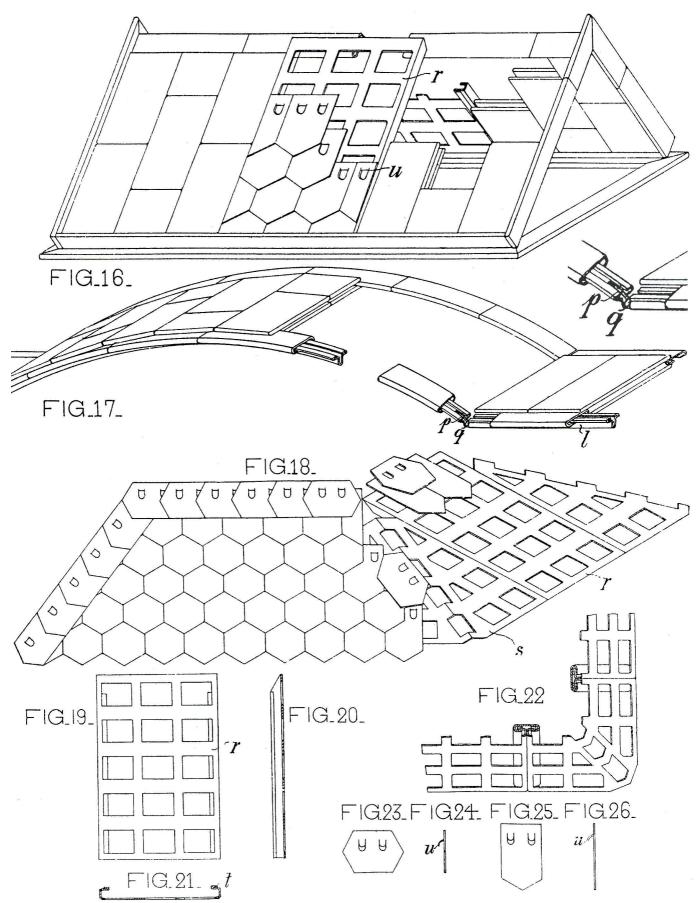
shows a simple pitched roof sitting on the top of a substructure, but not positively attached to it. The ends (barge boards) and eaves are made like the footings, and corner posts form the ridge. The infill can be panels or tiles, u, with lugs to clip them onto the frames, r. No infill for the gable ends is suggested. As shown panels holds the eaves and the barge boards together at the corners but I suppose that the T piece with hinged tongue shown in Fig.17 could also be used.
